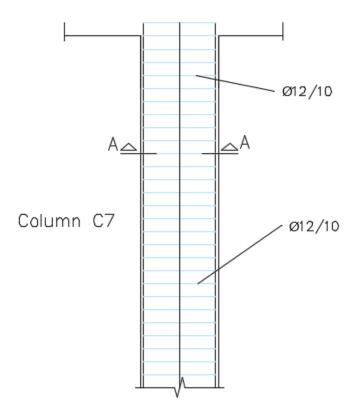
Column C7, C3 and C6 Shear Reinforcement Detailing
